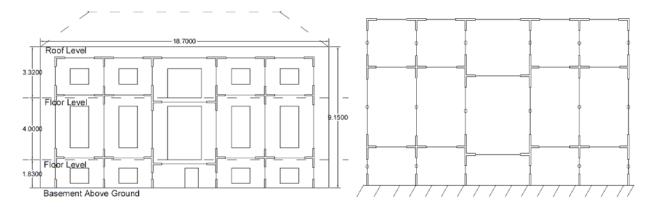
Discretization of walls into equivalent frames representing the piers, spandrels, and the rigid connection. Units are in meter.
